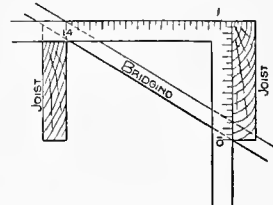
A Method of Laying Out Bridging with the Carpenter's Steel Square
